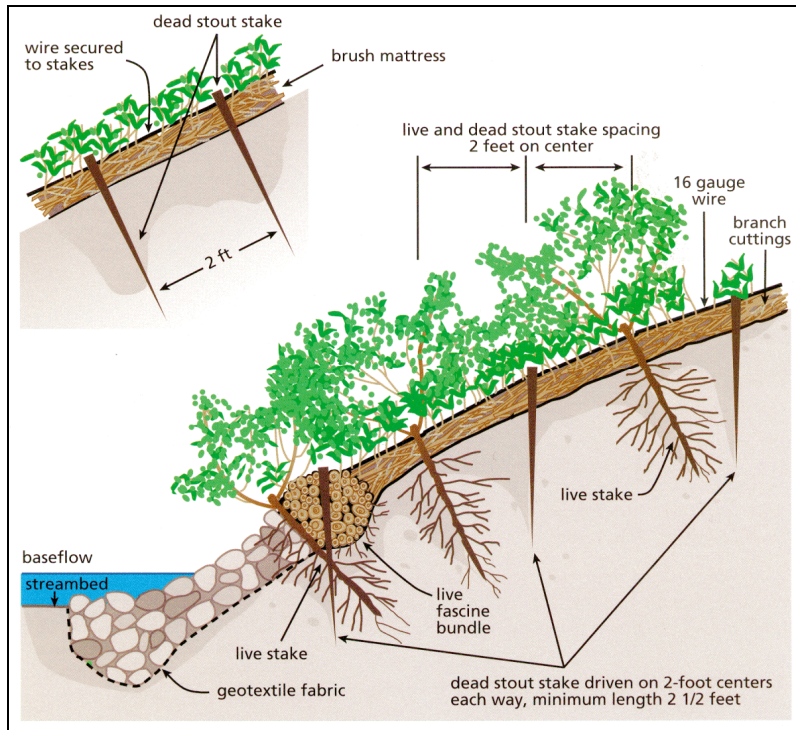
Details of brush mattress technique with stone toe protection (FISRWG 1998).
